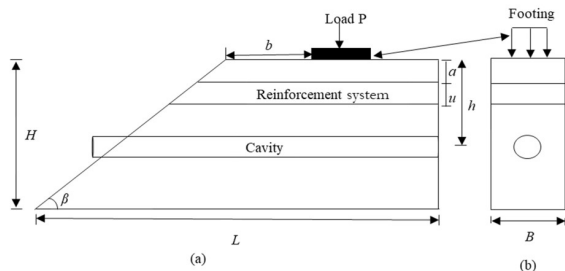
Schematic diagram of a shallow footing near slope: (a) side view and (b) cross-section along the footing.
